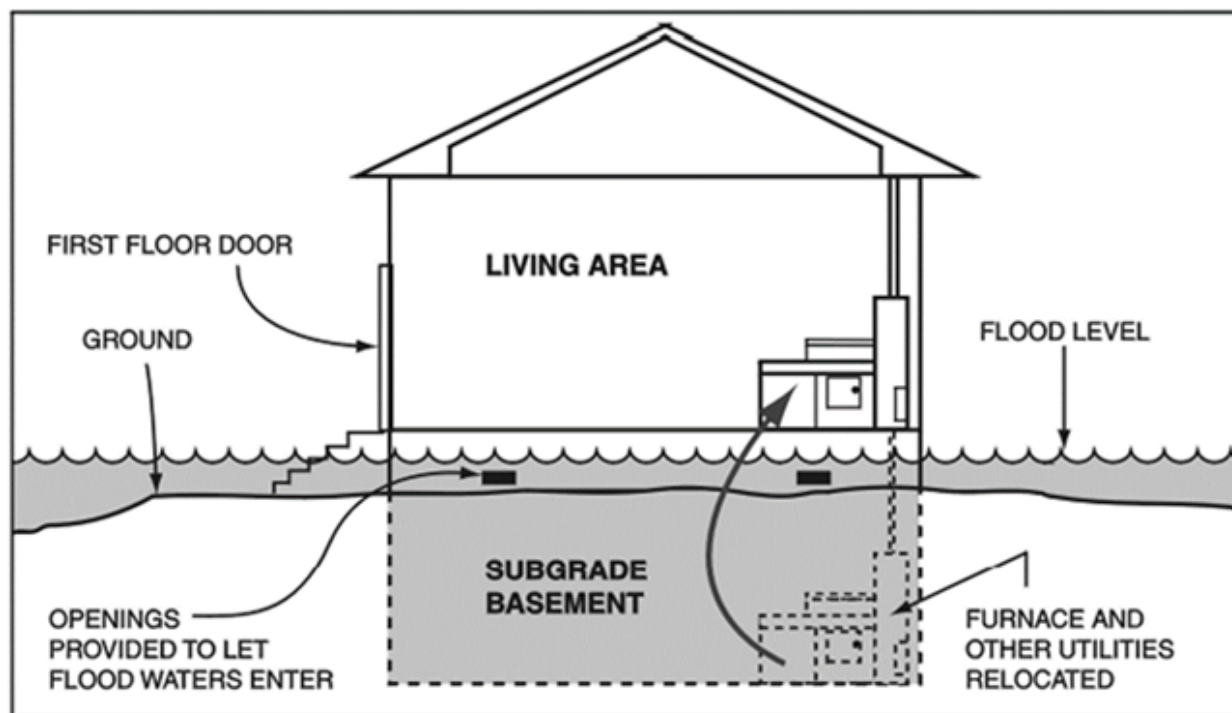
Wet Floodproofing Depiction (FEMA 551, 2007)
